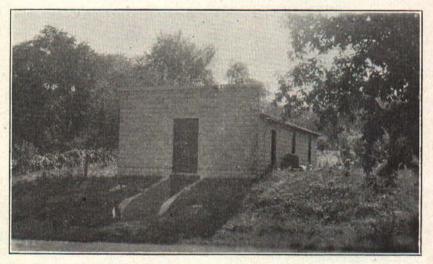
An underground storage cellar with additional storage above ground. The storage above ground must be well insulated.
